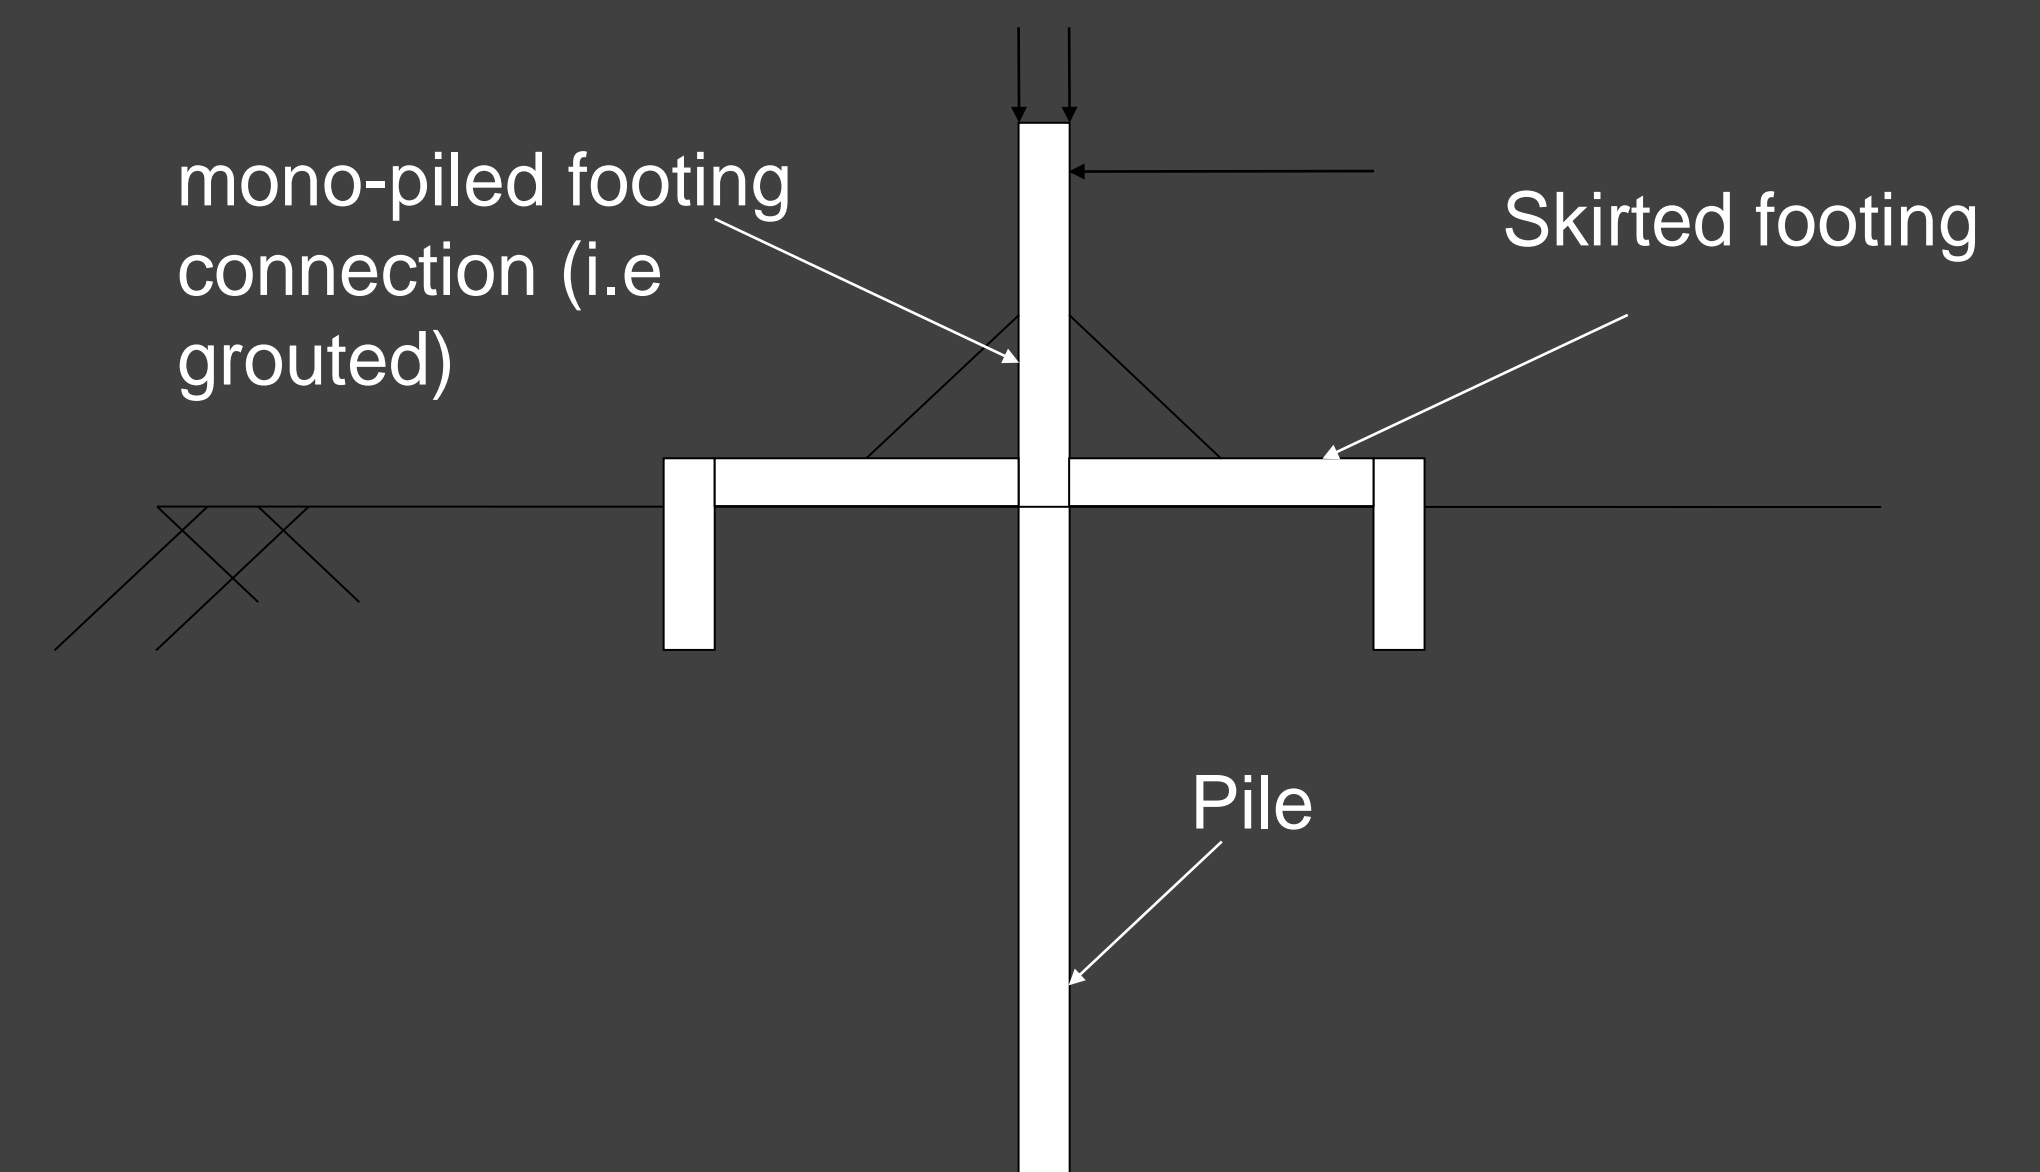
Structural arrangement of the hybrid monopile-footing foundation system
